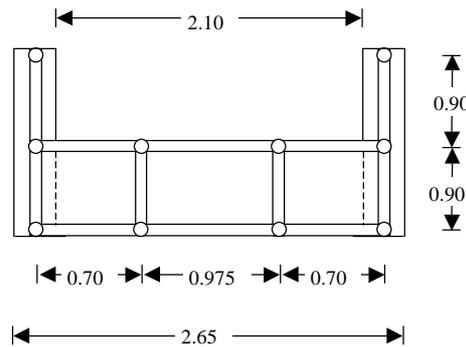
Plane frame idealisation of the cross-section at the arch key of the Porta bridge
